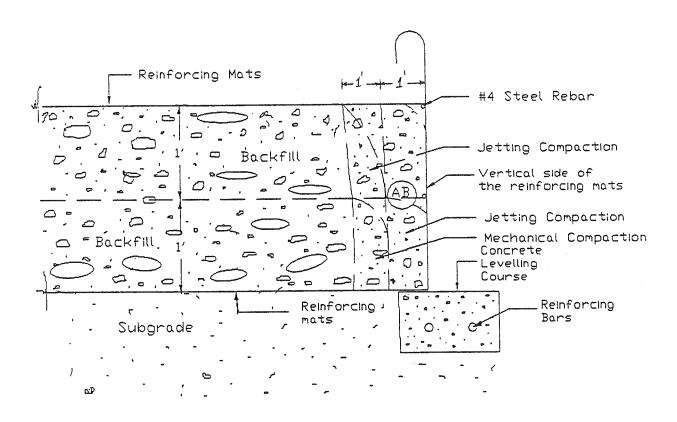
Schematic Diagram of the Lowest 2' Section of the Hilfiker Reinforced Embankment.
